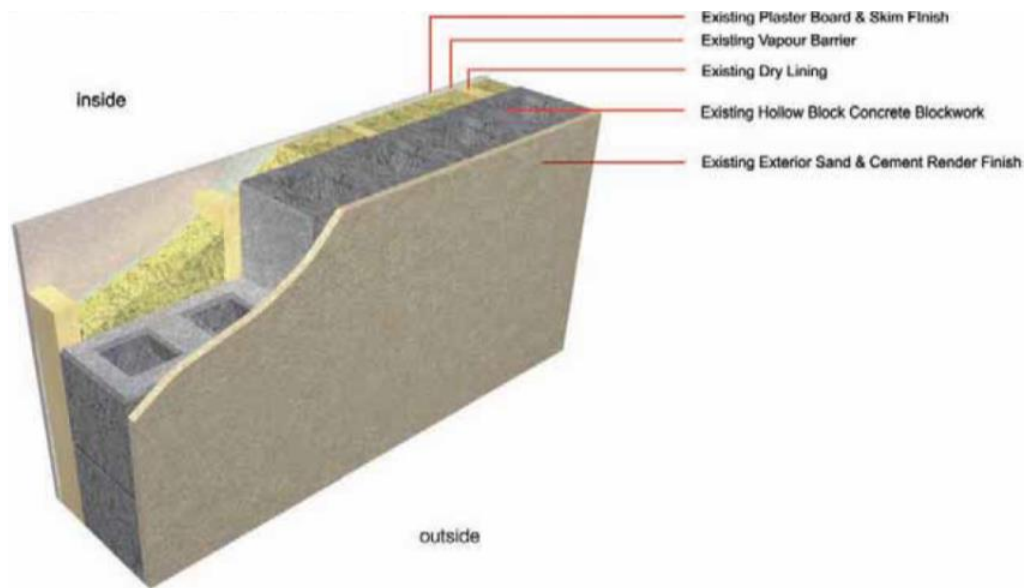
Typical dry-lined hollow block external wall construction (Source: SEAI - Passive House Retrofit Guidelines)
